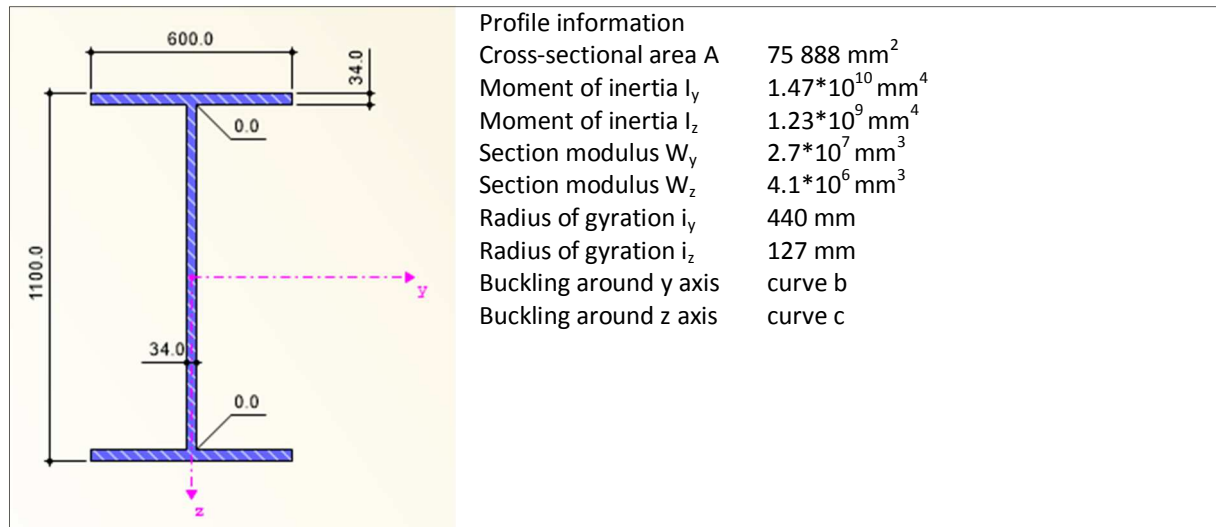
Welded steel section arch (steel grade S235 and dimensions in mm)
